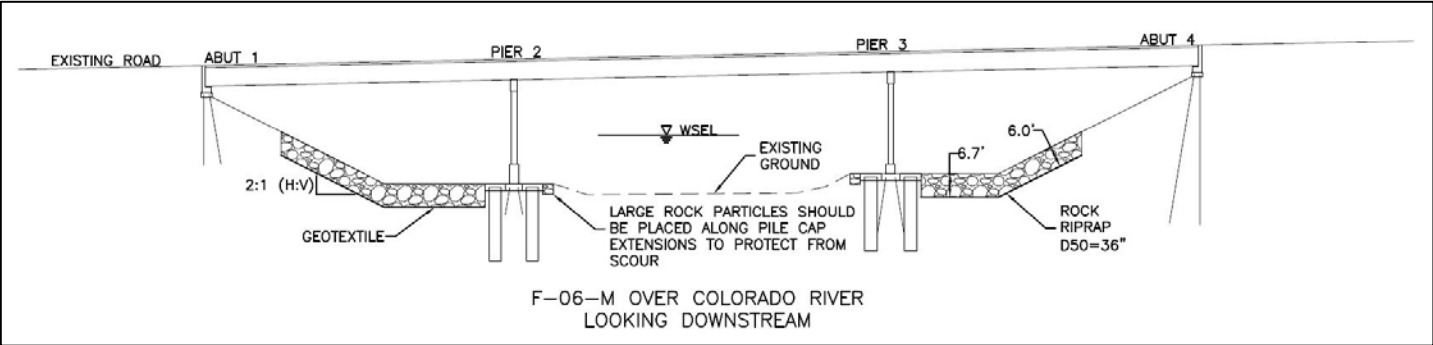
Cross-sectional view of Bridge F-06-M with recommended hydraulic scour countermeasures
